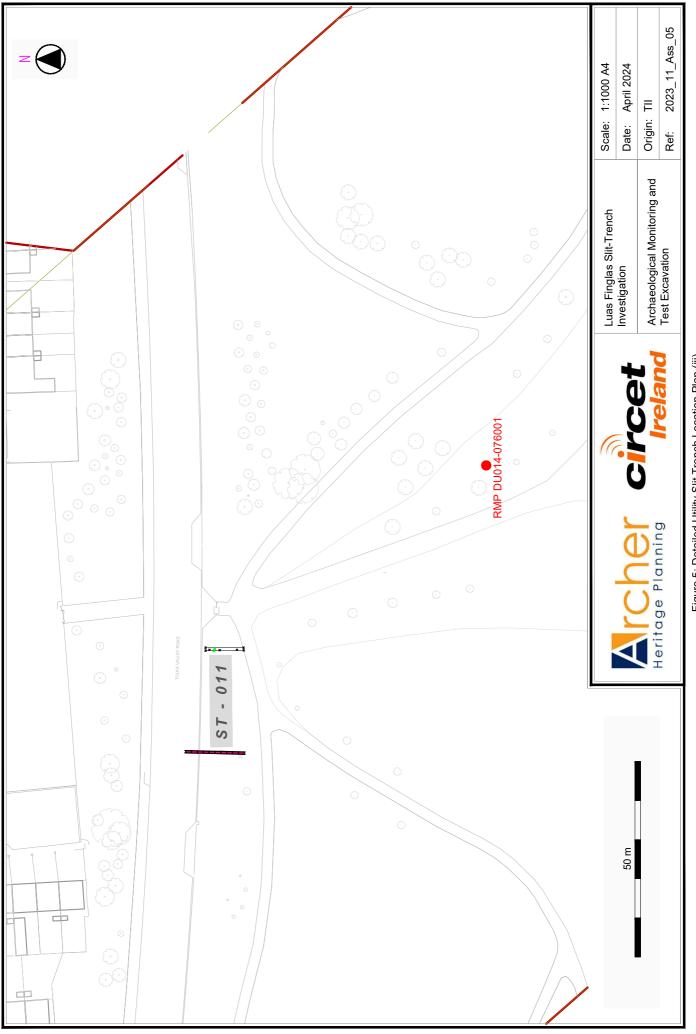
Detailed Utility Slit Trench Location Plan (iii)
